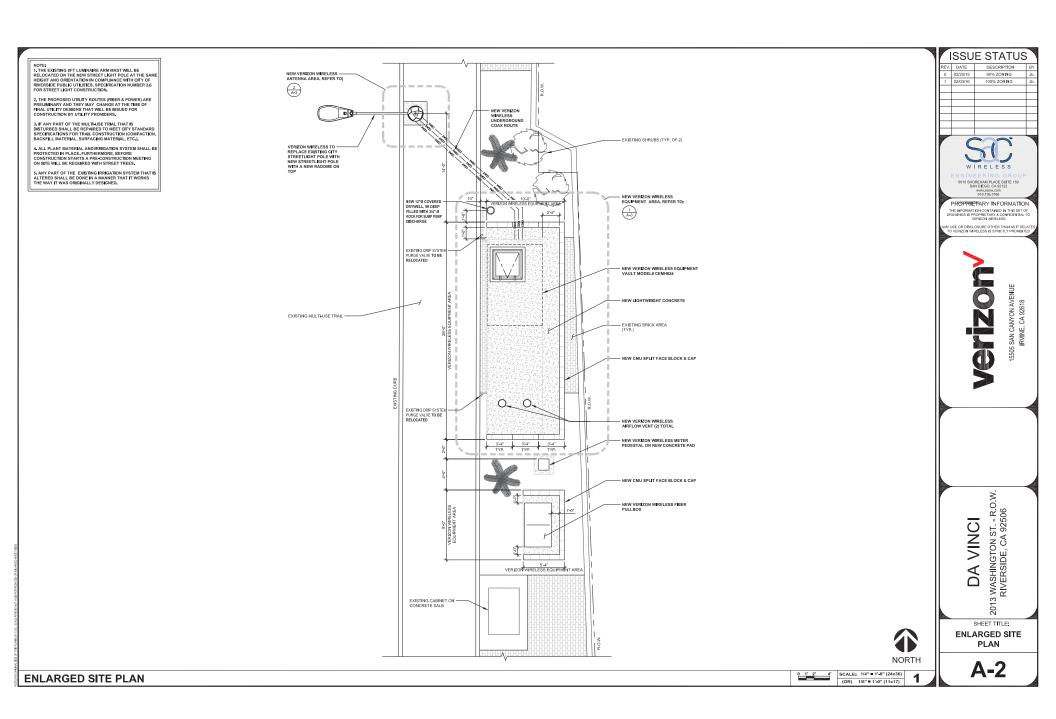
P15-0896 & P15-1040, Project Plans
